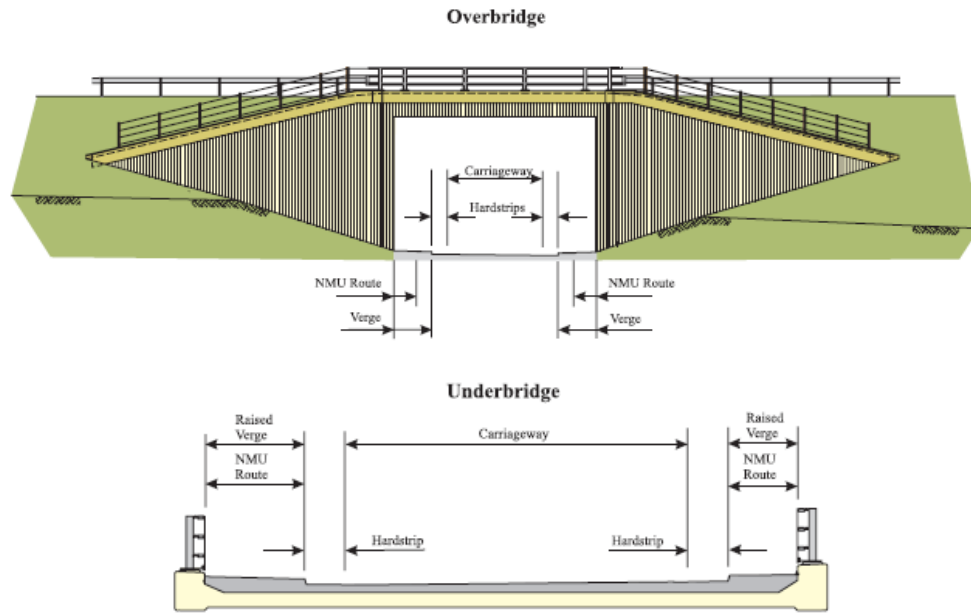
Rural All-purpose Single Carriageway: Typical Overbridge and Underbridge
